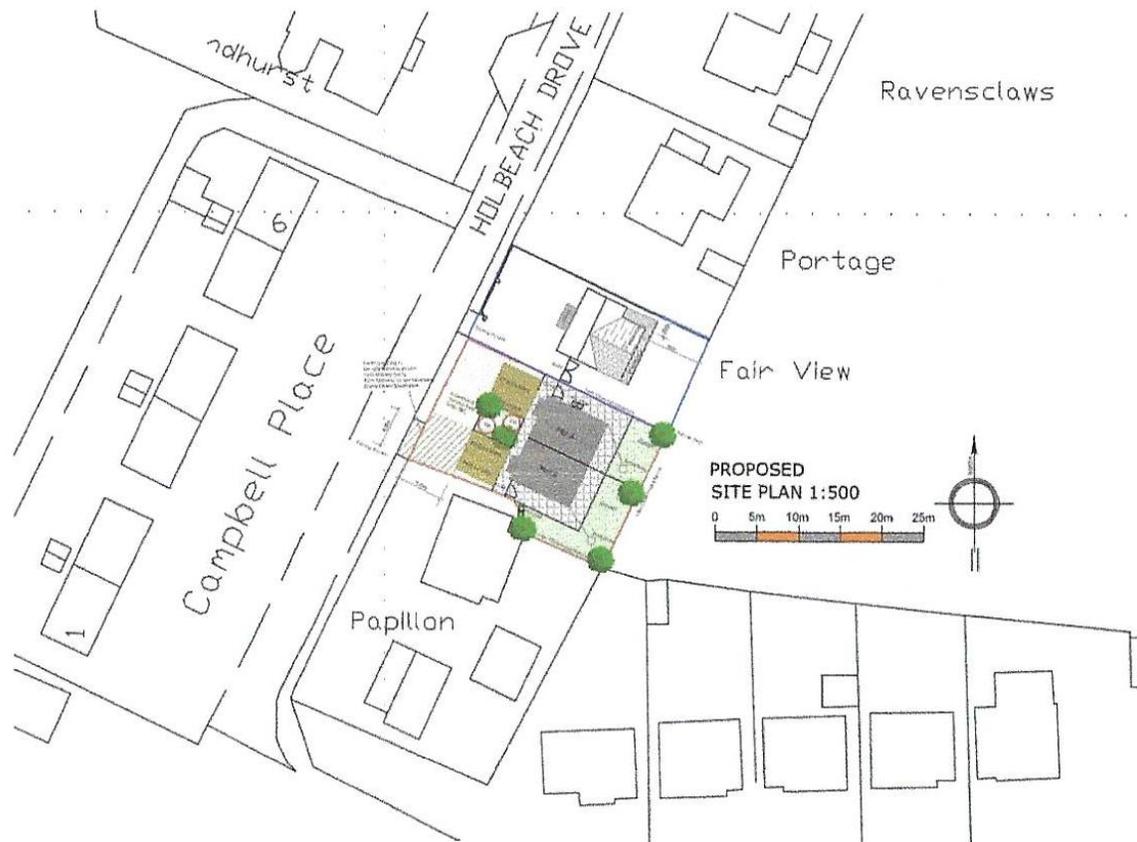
Block plan showing proposed layout of the development site at an original scale of 1:500, (extract from Architects plan)
